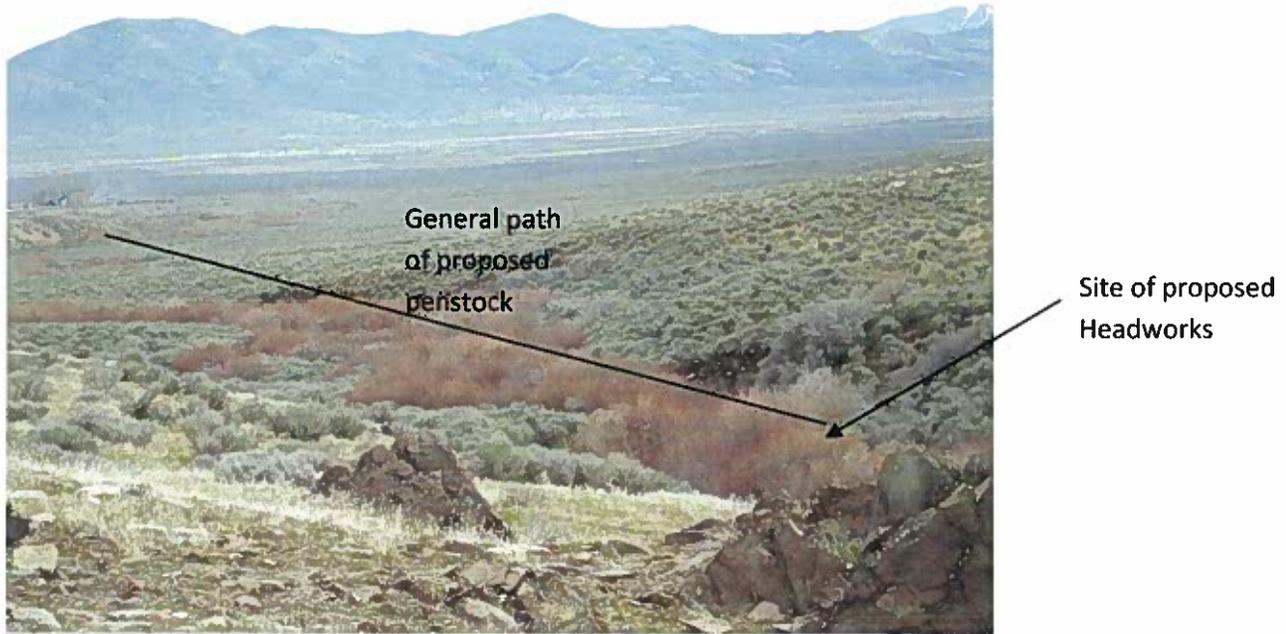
View looking west toward the Stone House and Abel Creek watersheds.
